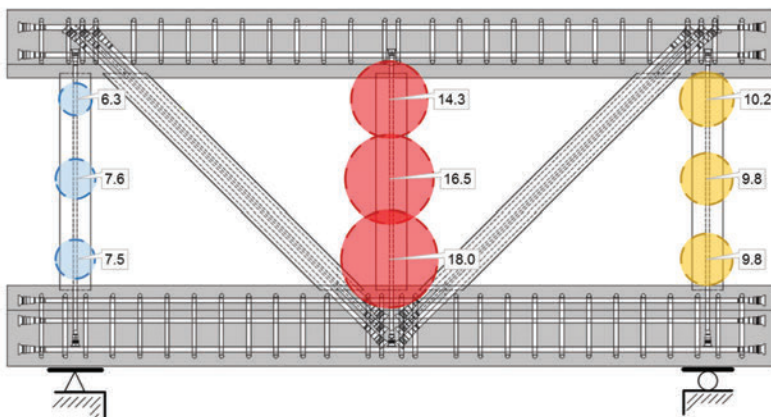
Location and severity of damage in the vertical truss elements of Girder 1
